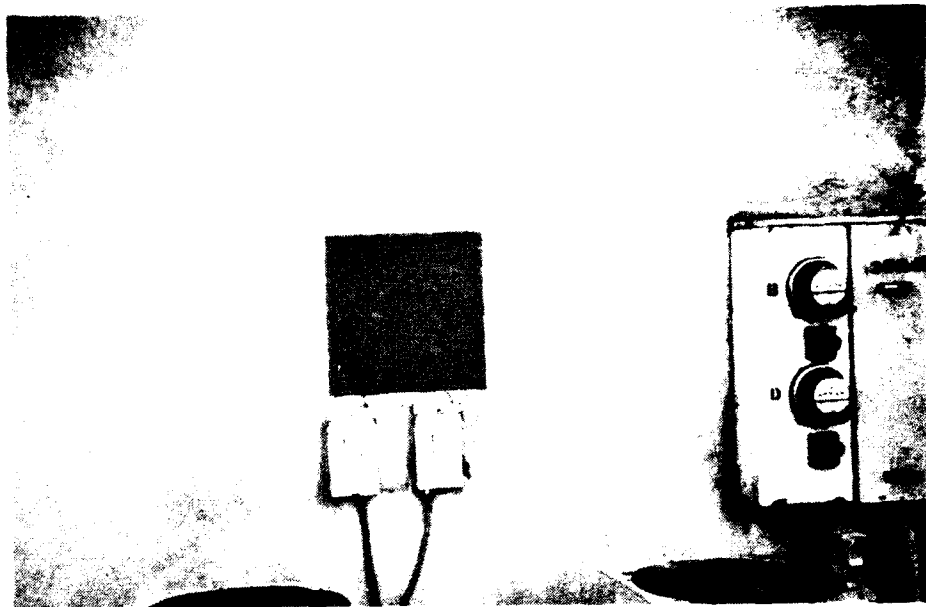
Exterior Wall with Electrical Service Junction Boxes
